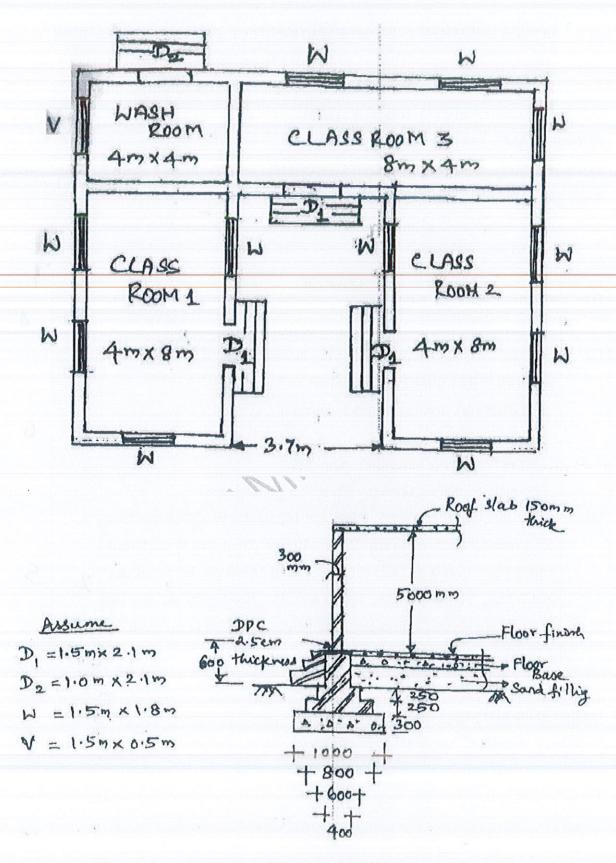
Plan and elevation of the room (All dimensions are in mm)
